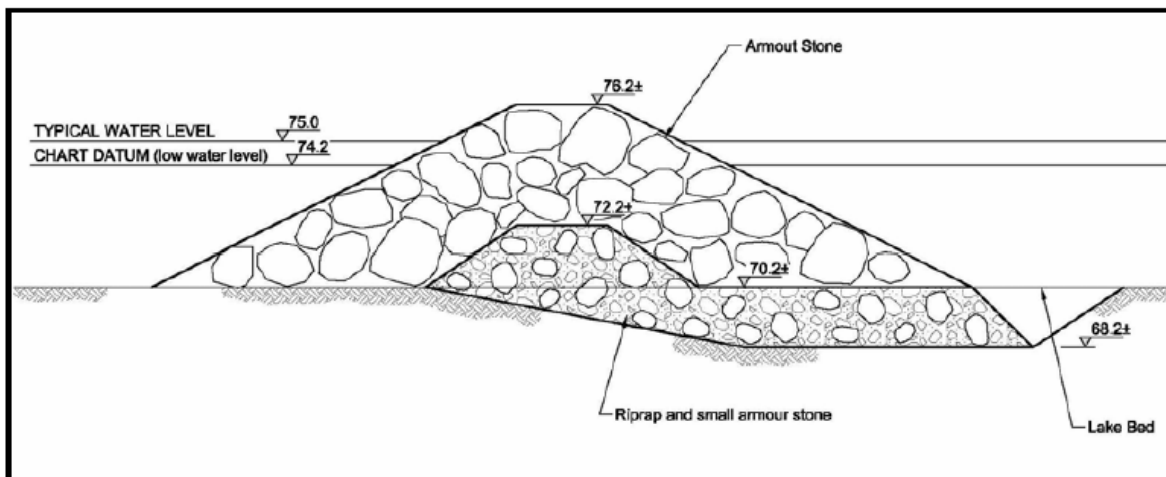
Typical breakwater cross-section. *Source: Shoreplan Engineering Limited, 2007.
